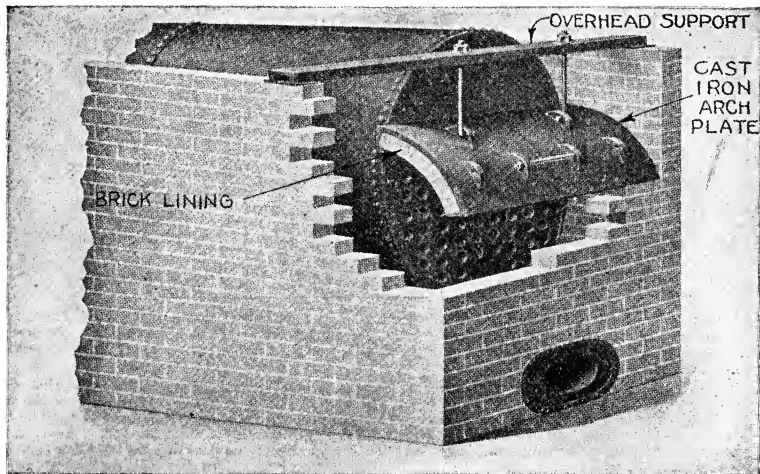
,517.—Monarch arch back connection with *outside* cast iron arch plate; view showing construction and method of support. In construction fire brick are placed in an arch-shaped casting mould and molten iron run over the back and ends of the arch. As the iron cools after being poured into the mould around the brick, it shrinks slightly and takes a firm grip on the brick, pressing them tightly together so as to form a practically solid arch—a very excellent construction.
